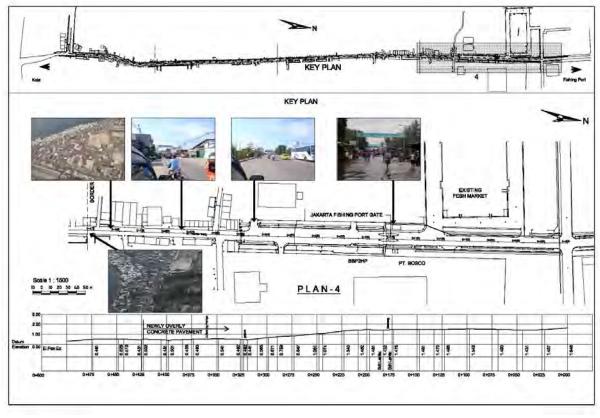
Existing Condition of Access Road (Jl. Muara Baru) (4)
